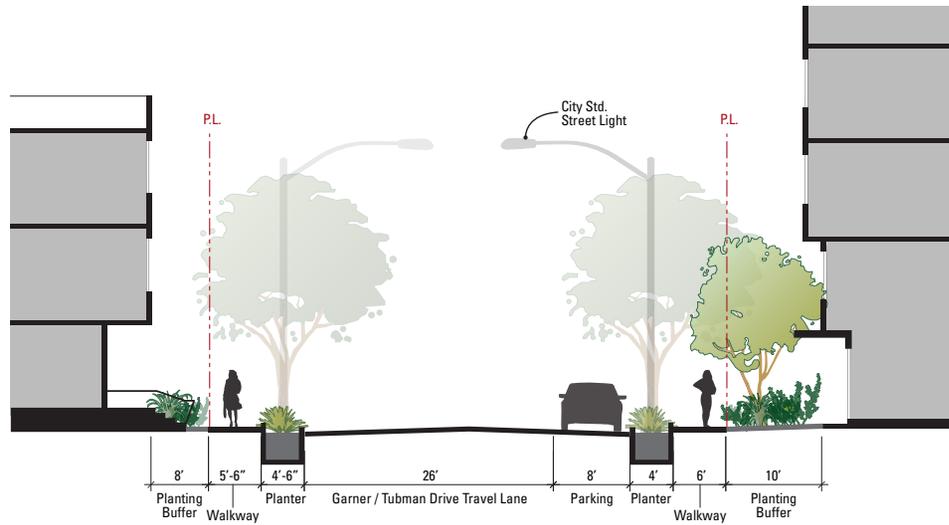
Section G. Garner Drive and Tubman Drive typical section
